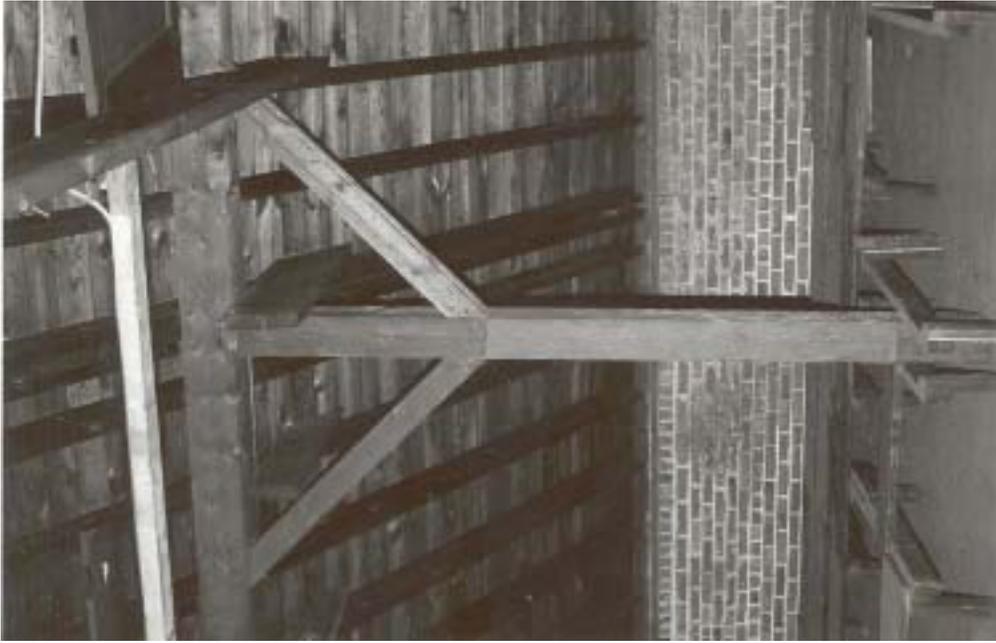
Room 301 (north part of attic), west side: roof framing (posts and braces supporting purlin) [1993].
